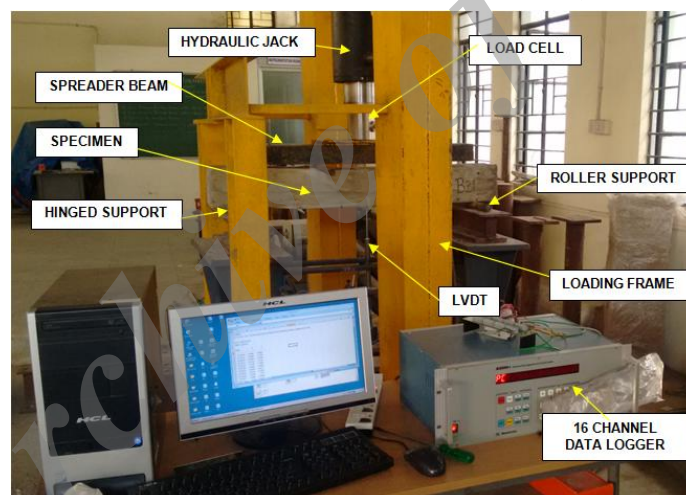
Test Setup for concrete filled GFRP thin walled tubular beams
